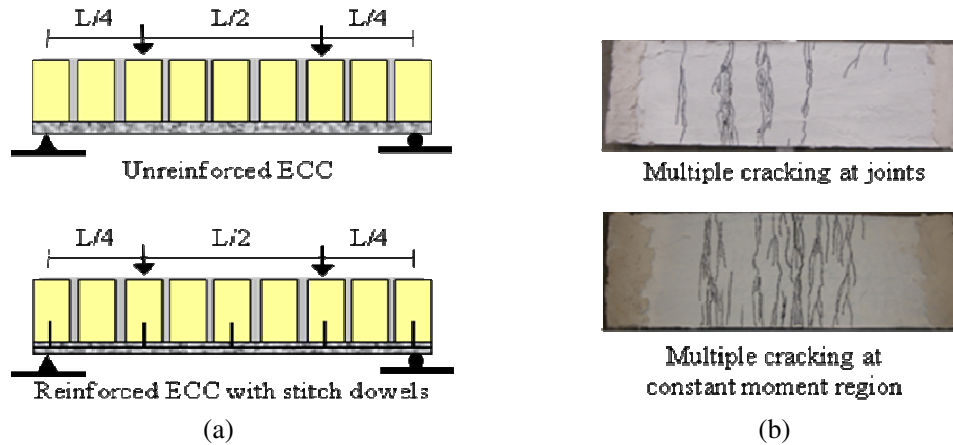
(a) Load application and (b) cracking response of 4-point bend specimens with unreinforced ECC (top) and with ECC reinforced with 0.1% steel (by area) and attached to screw anchors (“Stitch dowels”) grouted into the masonry.
